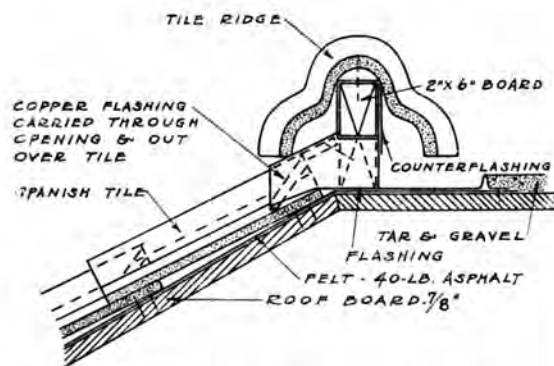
Method of Flashing at Deck to Carry Water over Tile
